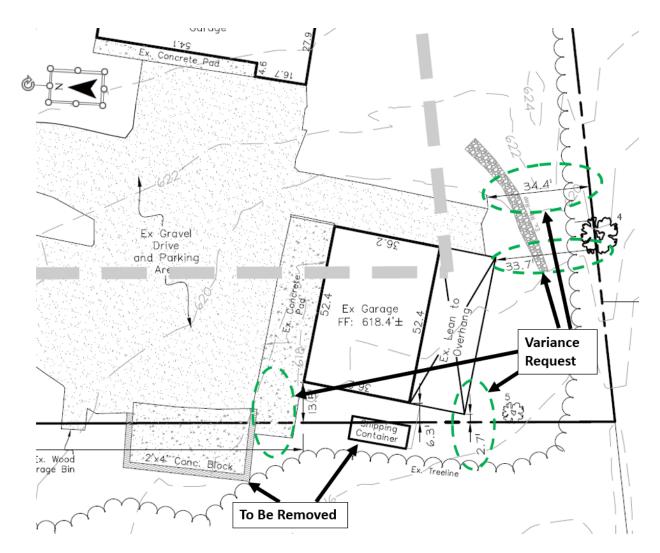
Figure X: Variance Plan for the existing "Lean to Overhang" and parking areas
